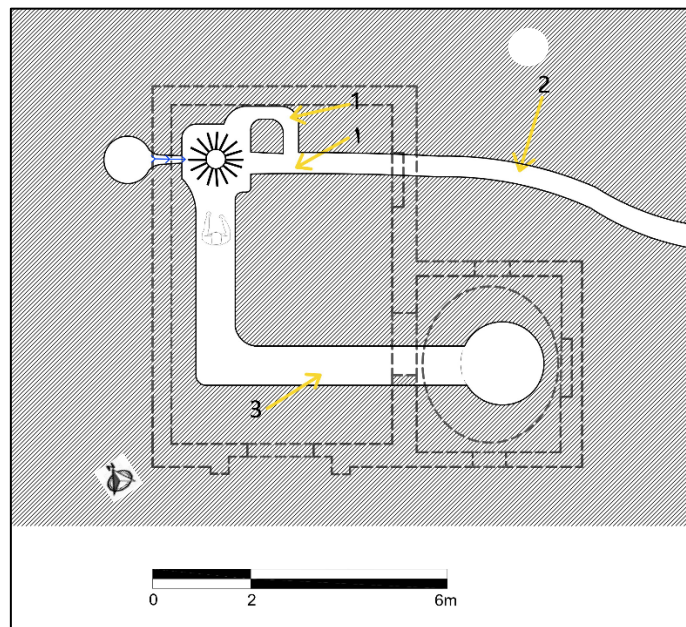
Basement plan representation: 1) Water escape channel; 2) Chadi (underground passage leading to the turbine); 3) Outflow path toward agricultural fields.
